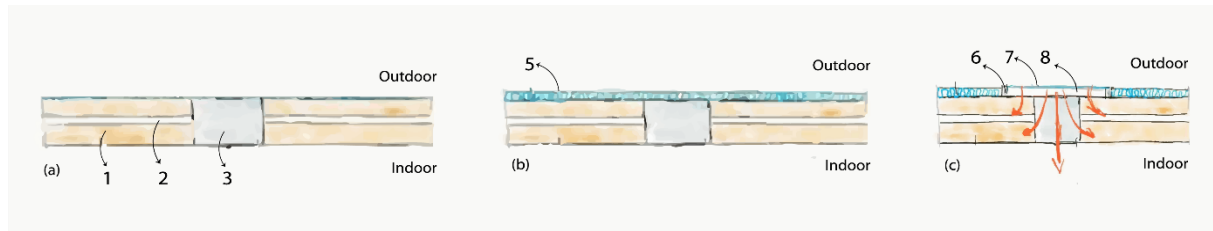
Horizontal cross-section view of the three types of walls studied in this PhD work: (a) Wall Model 01 – Pre-retrofit wall, (b) Wall Model 02 – Retrofit with ETICS and (c) Wall Model 03 – Retrofit with SBRS: 1 – Masonry; 2 – Air space of the cavity wall; 3 – Concrete column; 5 – ETICS; 6 – Frame of the glazing; 7– External transparent skin (glazing); 8 – Air space of the SBRS. Adapted from [84].
